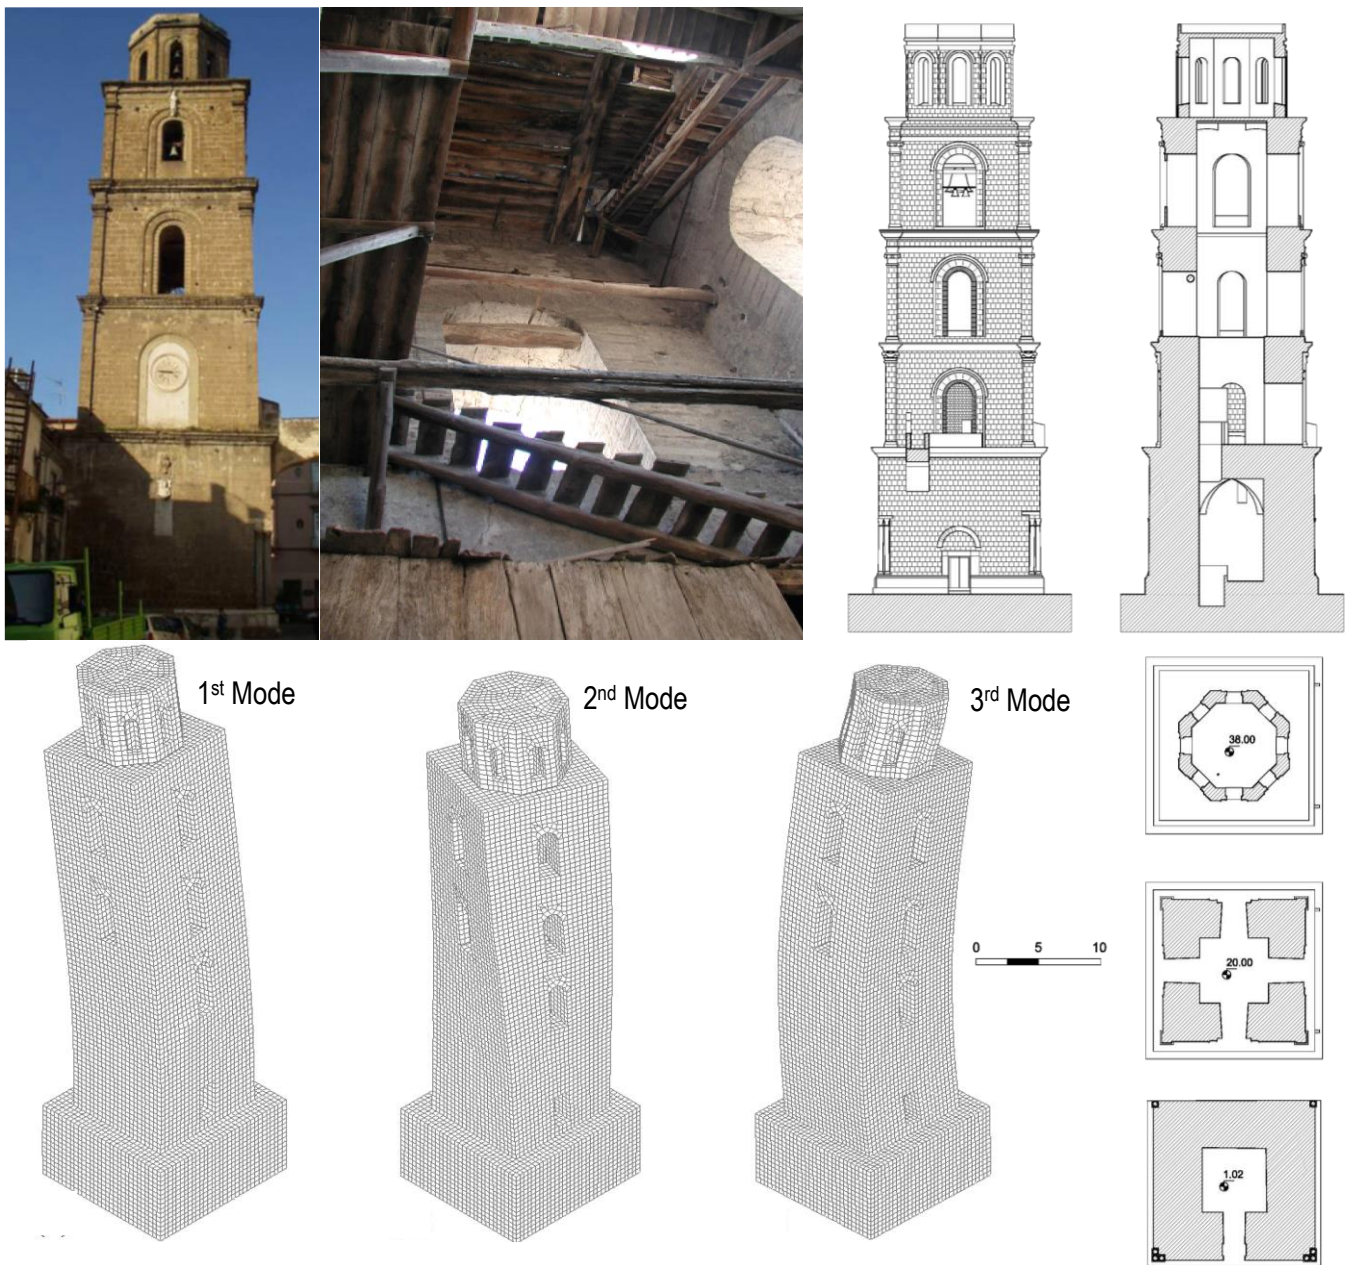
The bell tower of the Cathedral of Aversa: general view, internal view, façade, sections, mode shapes
